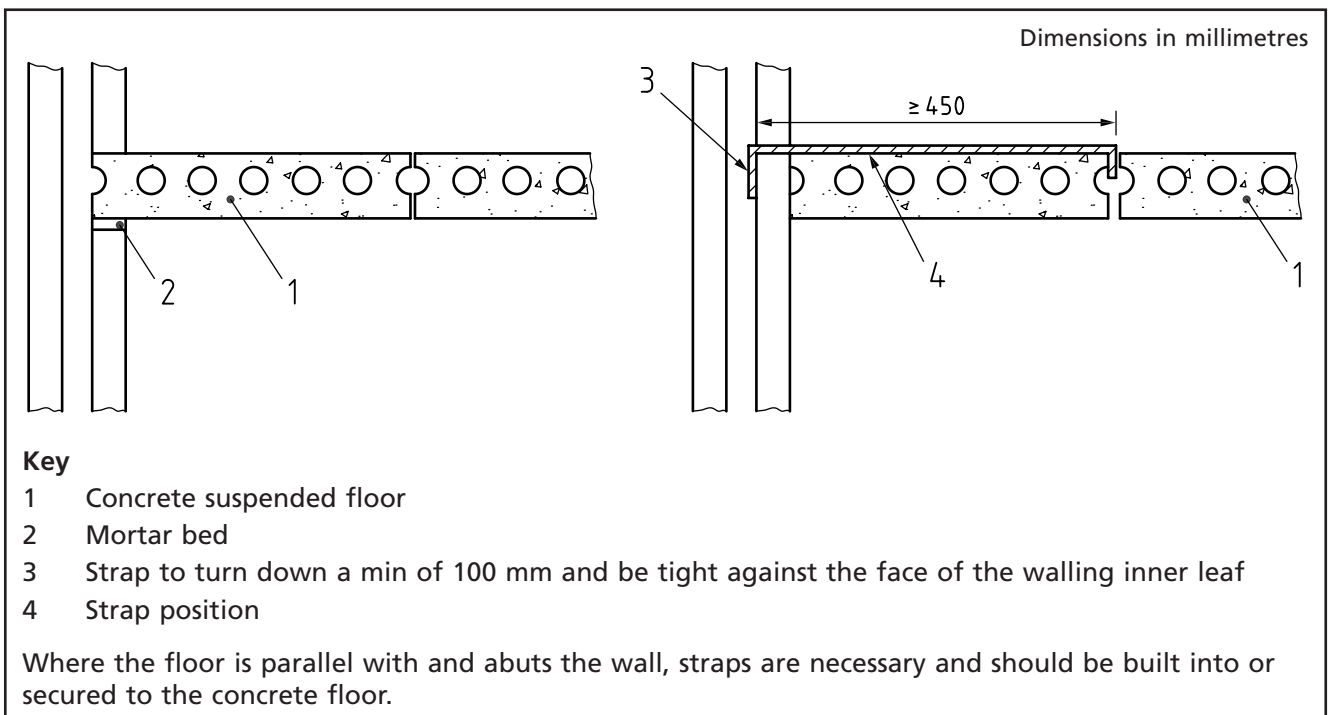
Precast concrete beam and block type floor abutting or spanning on to wall
